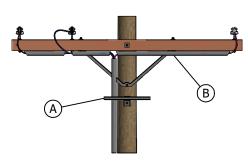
CROSSARM CONSTRUCTION #2 CABLE MAX. FRONT VIEW
